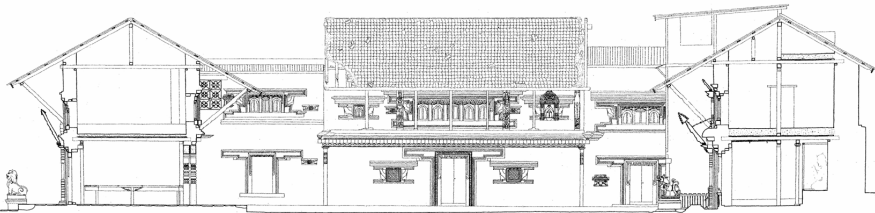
South Wing Façade: existing and proposed restoration (Drawing by Bijay Basukala)
